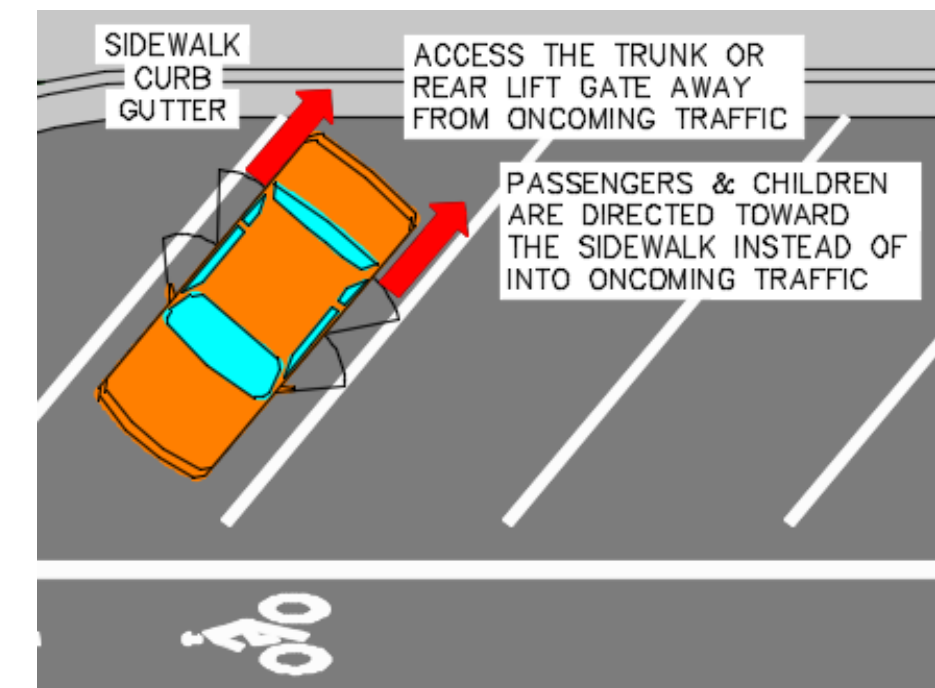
Back-In Angle Parking Passenger & Trunk Access
